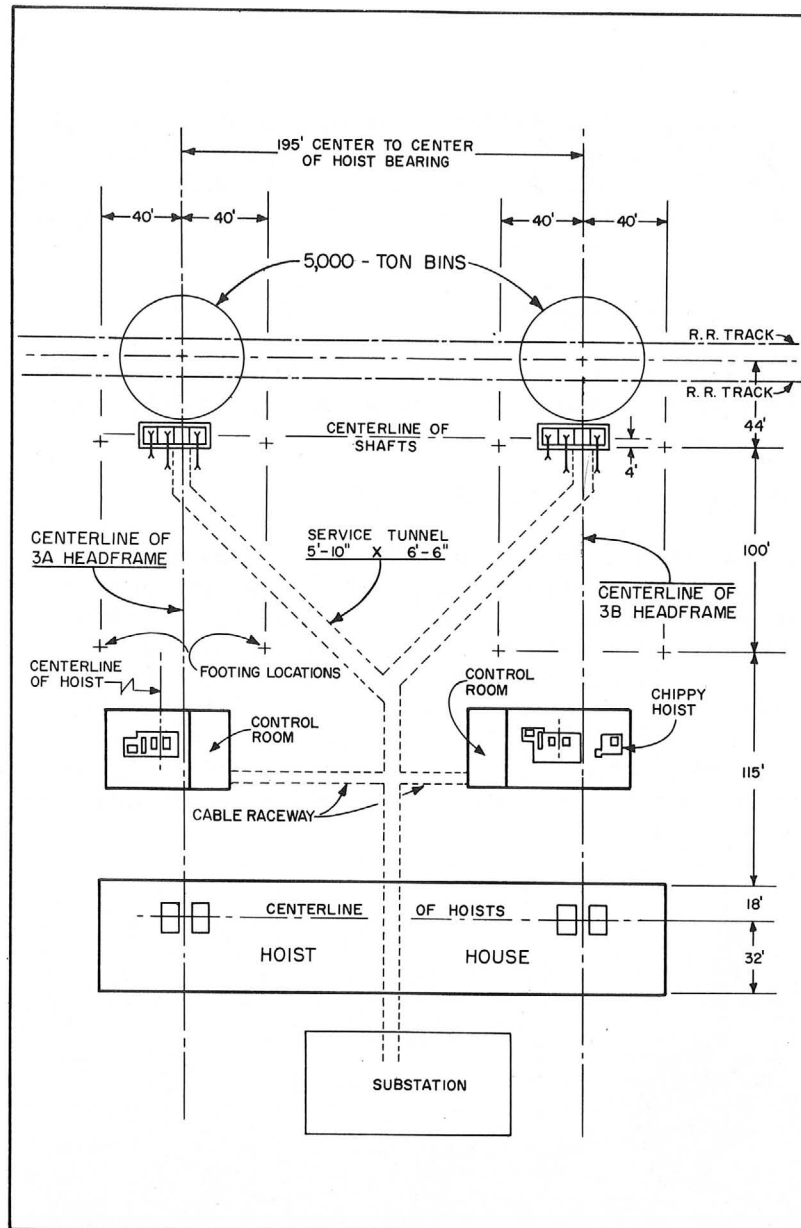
Plan of Surface Installations at 3A and 3B Shafts.
